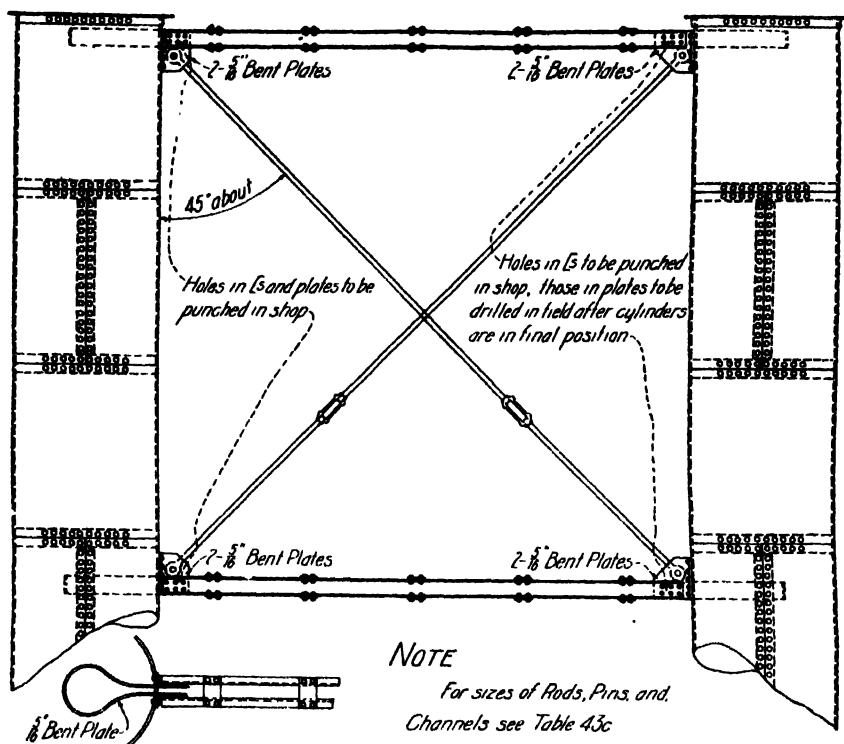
Details of Open Bracing for Steel Cylinder Piers.
